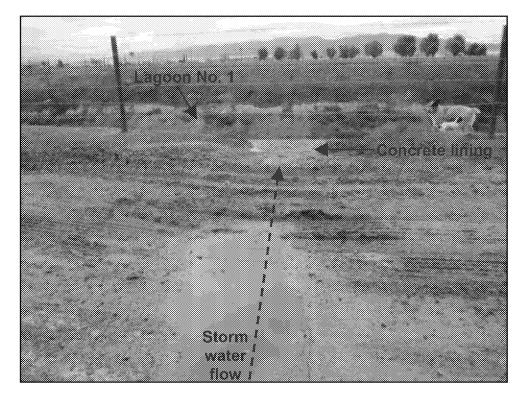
View facing north of the concrete spillway located on the west side of catch basin No. 1, shown in Photographs 6 and 7.
